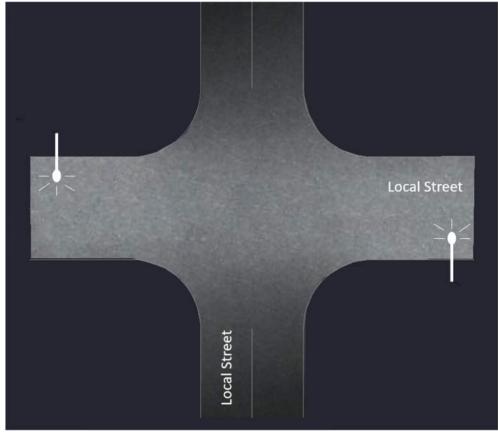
Rendering of 4-Legged Intersection: Local Street vs Local Street – Top View
